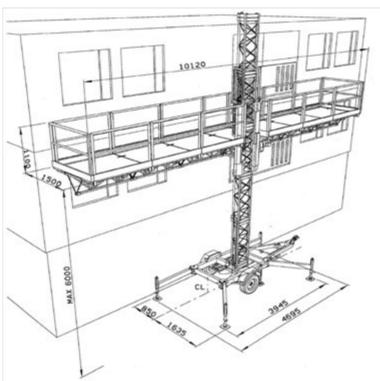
SC1000 twin on wheel chassis, free standing.
